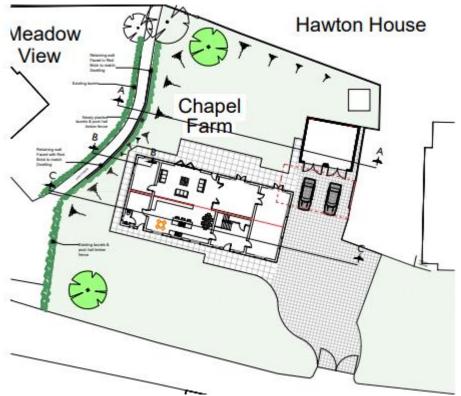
Proposed Site Layout Plan (received 03 January 2023)
